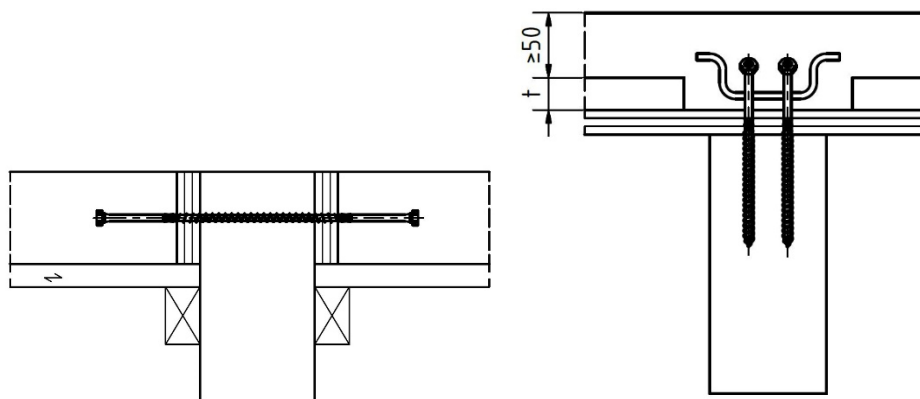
Alternative cross sections of the wood-concrete composite slab kit – exemplary
